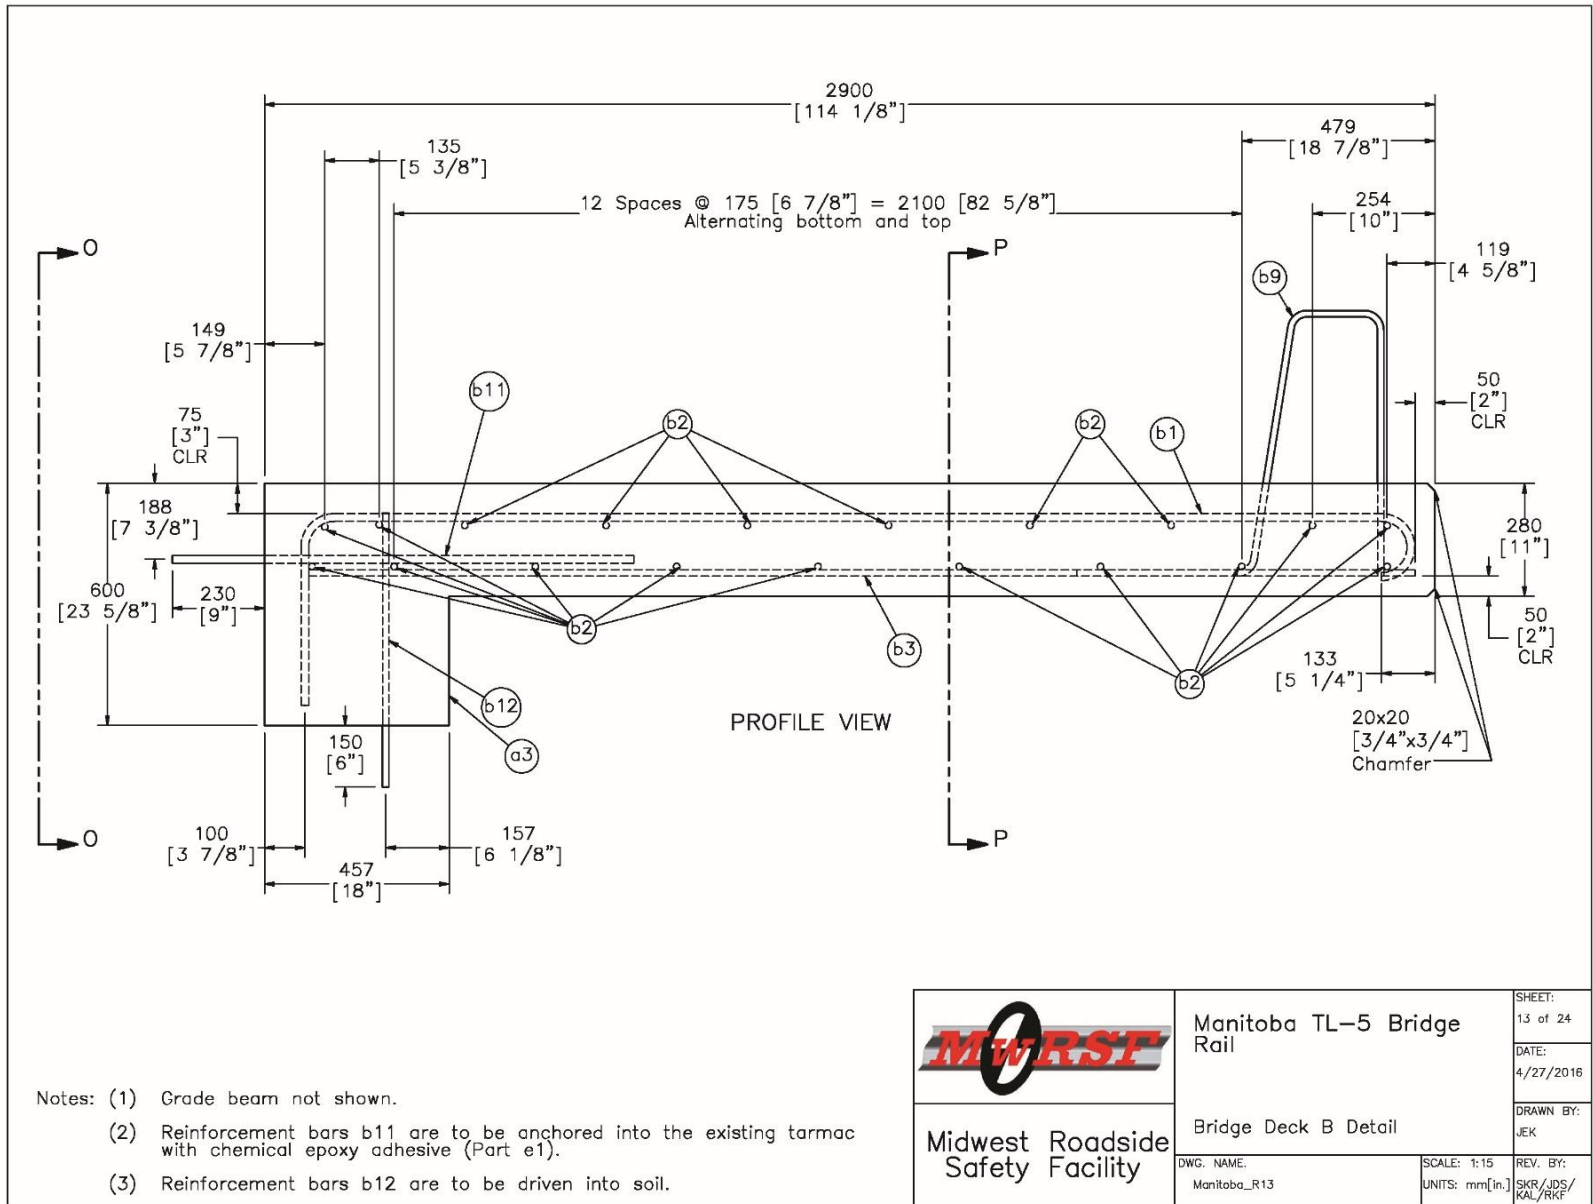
Bridge Deck B Detail, Test No. MAN-1
